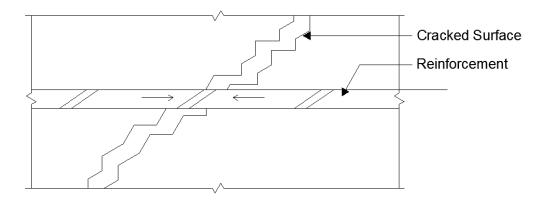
Section of a Deep Beam Showing the Horizontal Reinforcement Resisting Cracking
